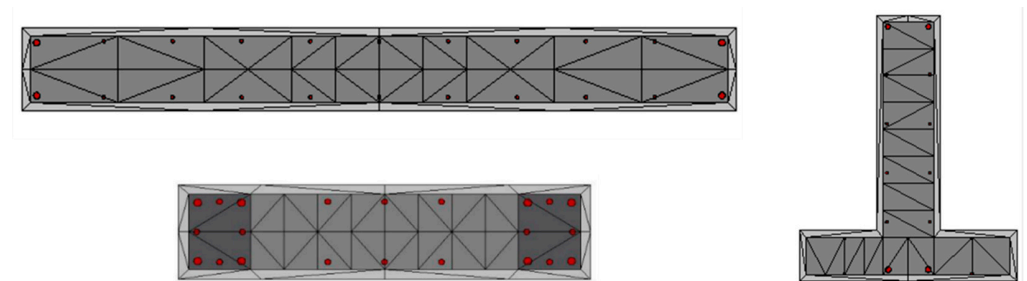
Examples of fiber discretization of shear wall and upturned-beam sections (not to scale, taken from SeismoStruct).
